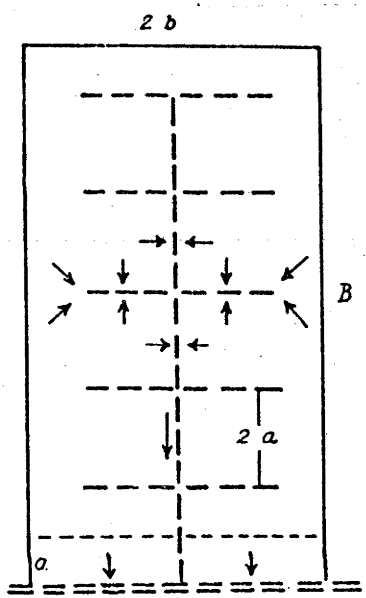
Schematic layout of a road system of parallel primary motor truck haul roads and secondary motor truck haul roads at right angles to the primary roads
